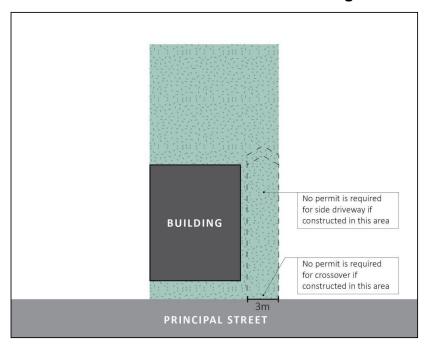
Construction of a new crossover and driveway is permit exempt if constructed in this location.
